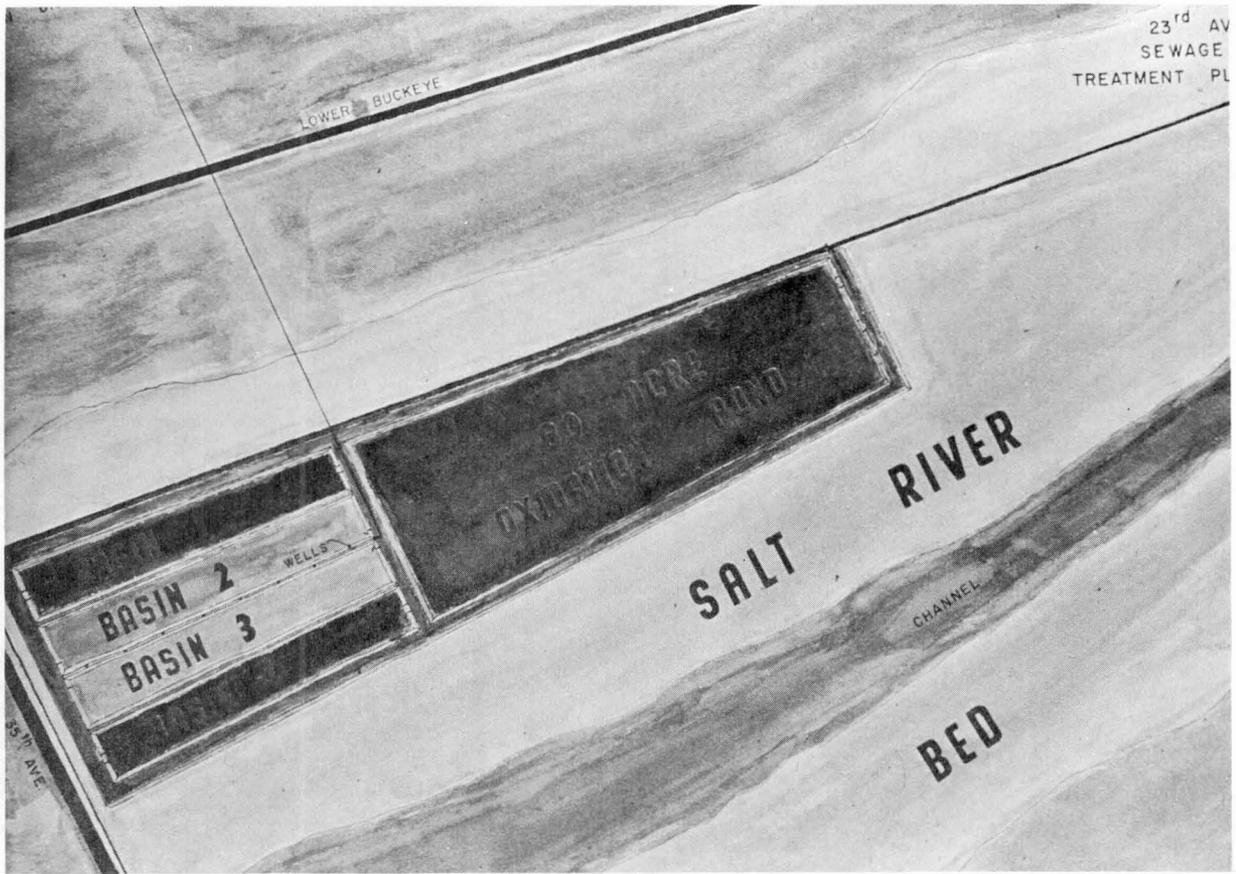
MODEL OF 23RD AVENUE LAND TREATMENT FACILITIES
